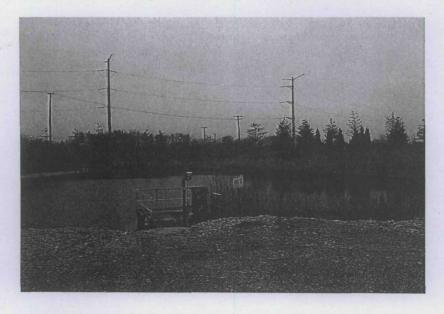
View to the north of the coal pile runoff settling pond (also known as Basin 3 or Pit 3).
